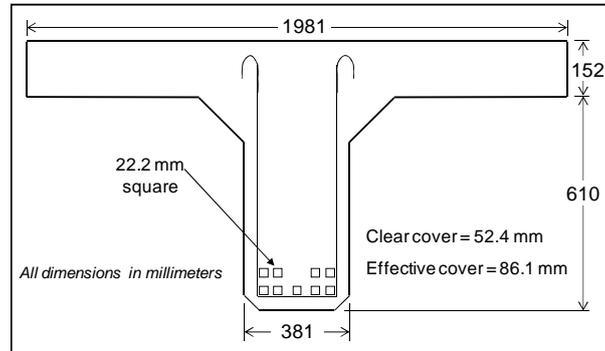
Cross-sectional details of the T-beam bridge girder (AASHTO 2003)
